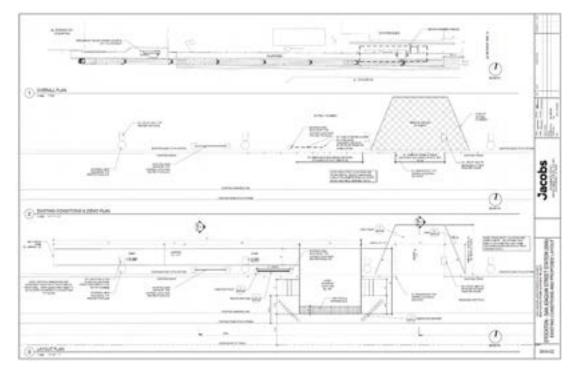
Stockton San Joaquin Station – Site Plan and Mini-high layout
